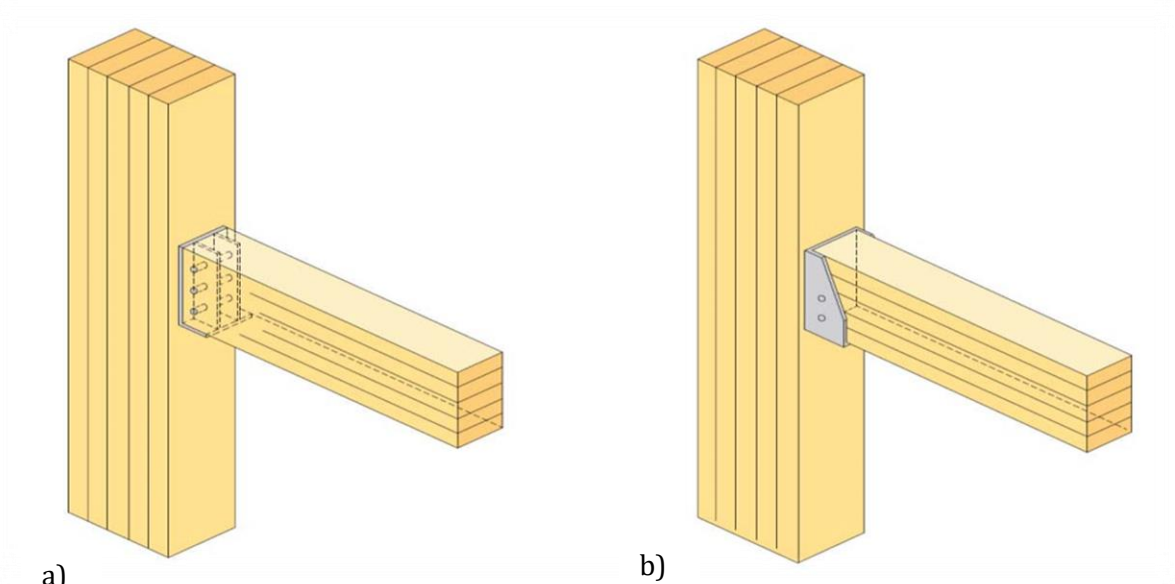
Two types of welded beam shoe connection a)Welded beam shoe with slotted-in (internal)steel plates b) welded beam shoe with external plates[2]
